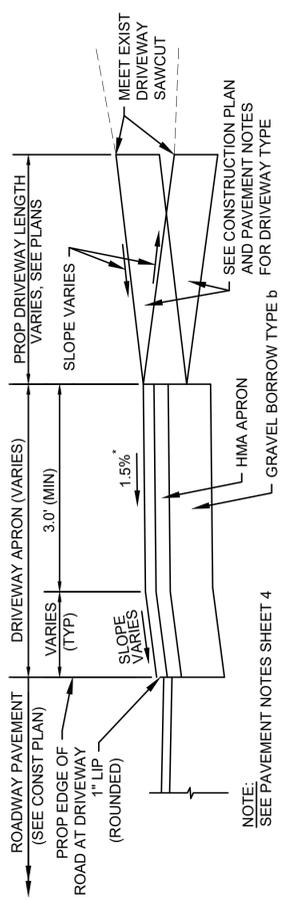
DETAIL FOR DEPRESSED DRIVEWAY WITH SIDEWALK - TYPE B
